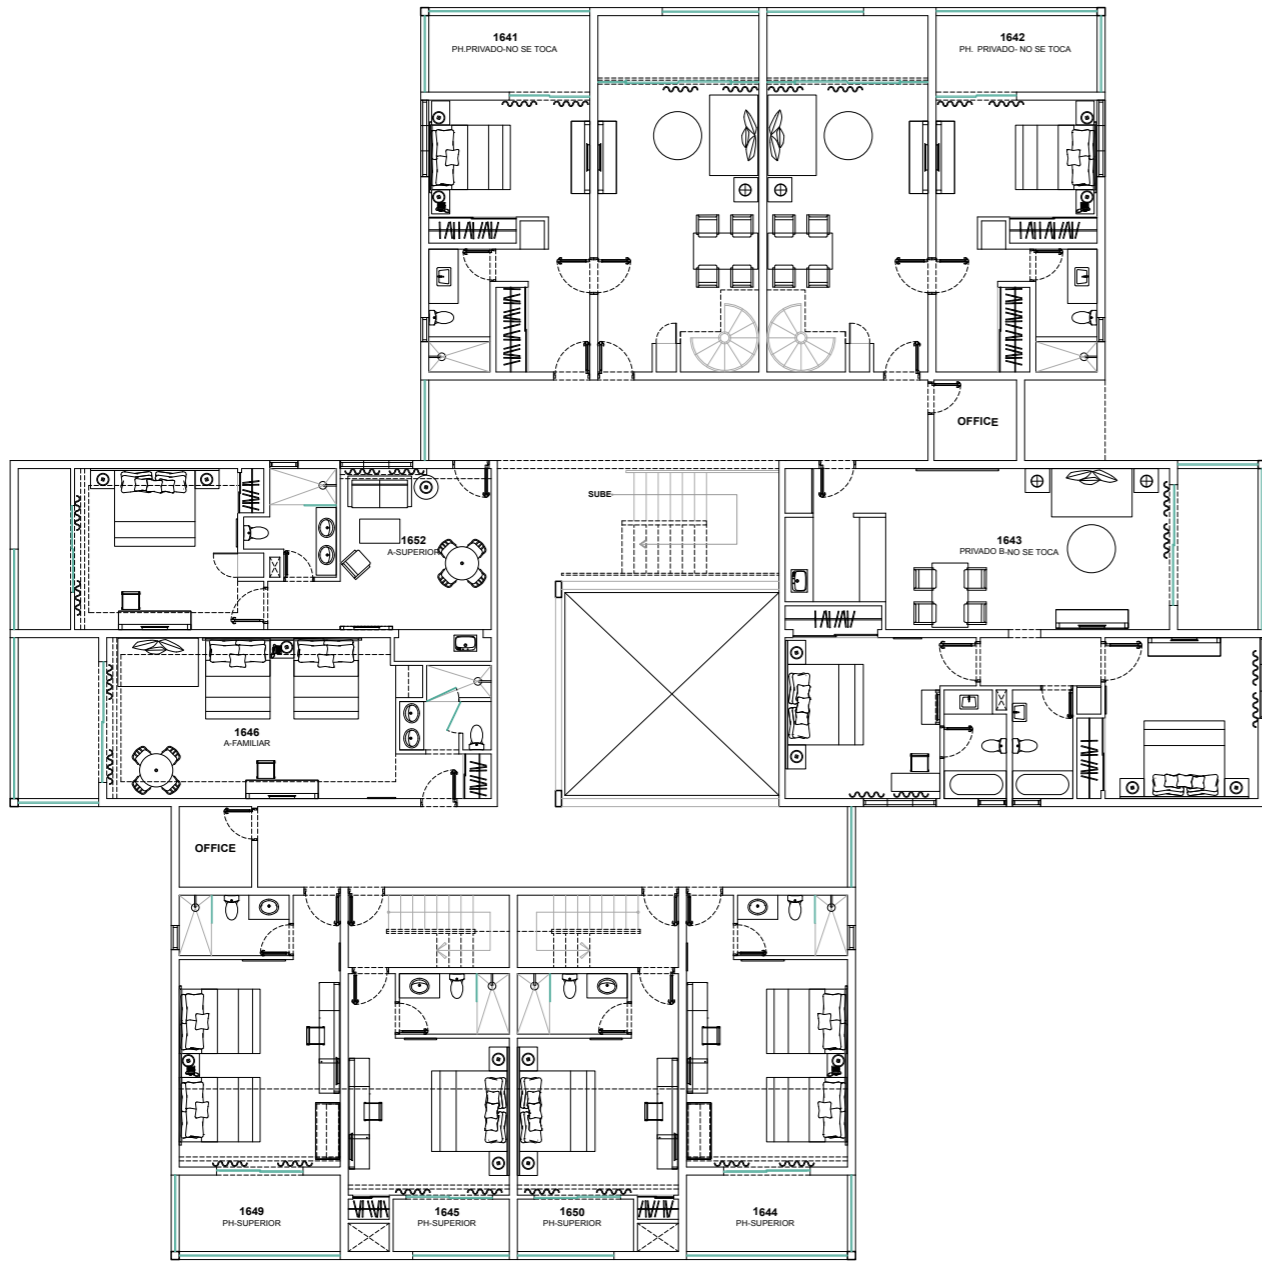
Second Floor Plan of Guest Block 16. Source: Emotions by Hodelpa (2021)
